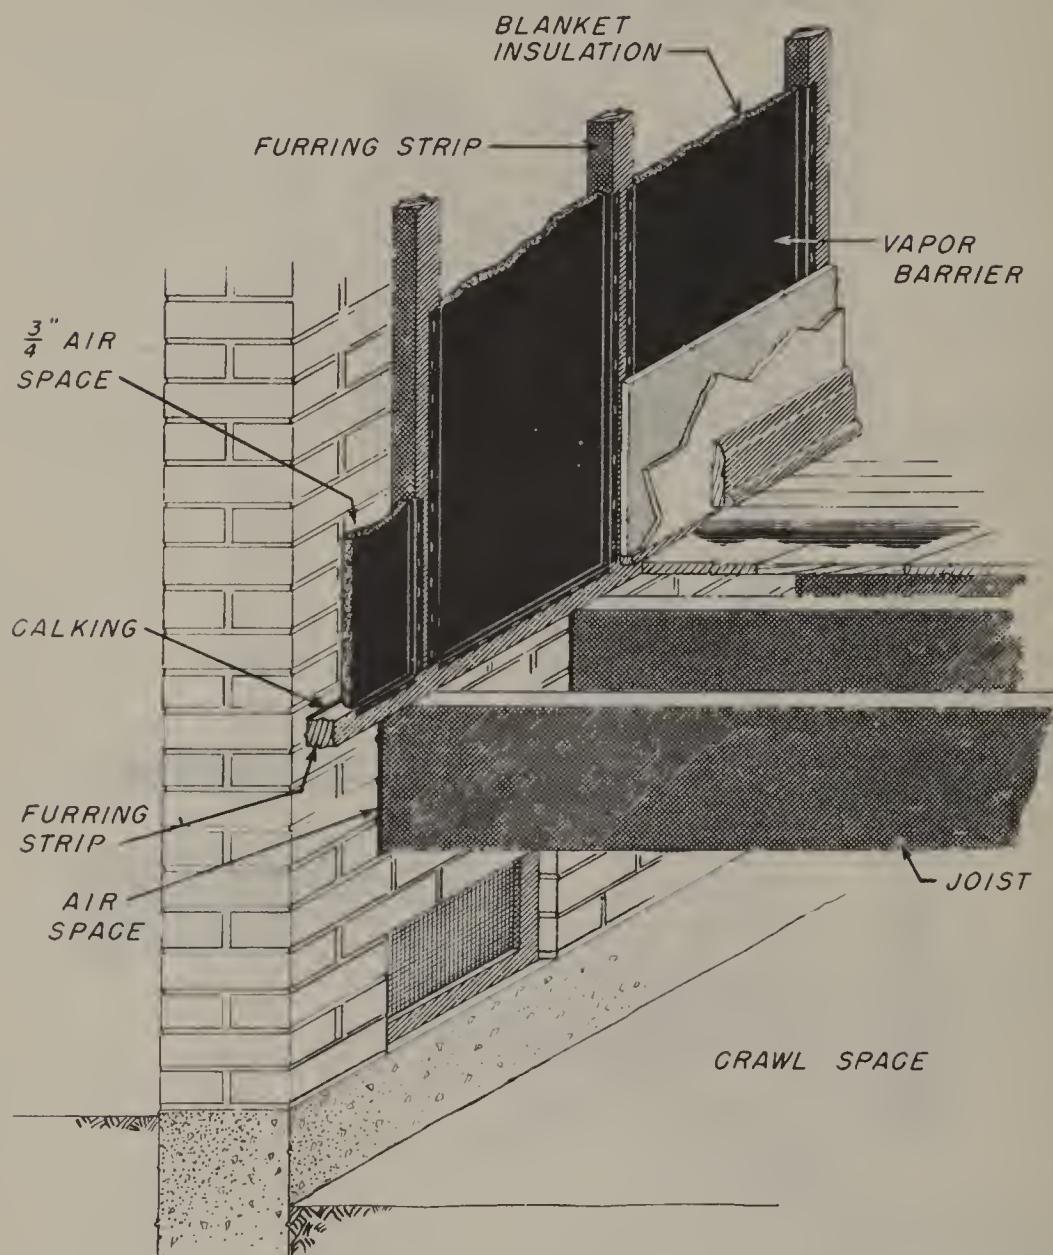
Side wall, first-floor level.* Condensation control is obtained in this detail by the use of a blanket-type insulating material carrying its own vapor barrier and attached to furring strips running vertically. A special feature of this detail is the horizontal furring strip shown over the top of the joists next to the brick wall; however, it could be laid above the subfloor as well. This strip should be laid tightly against the brick surface and if there are gaps between the brick and the strip they should be filled with caulking compound. The object of this treatment is to prevent the migration of water vapor from the crawl space vertically into the attic where it might become a problem. The thermal insulation consists of a blanket-type insulation with an air space between the blanket and the brickwork. The above covers walls only. See figures 17, 18, 19, and 20 for recommended details of floors over crawl spaces.
